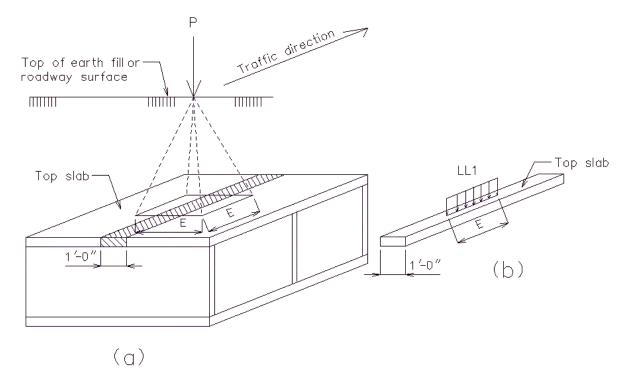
Distribution of live load for earth fill  $\geq$  2'-0" (a) A wheel load is uniformly distributed over a squared area (b) equivalent uniform live load (LL1) on a one-foot strip width
